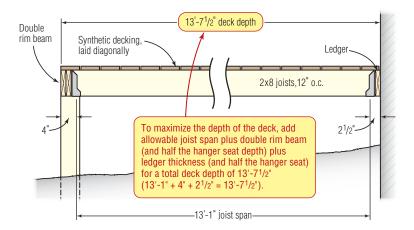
In this example, a deck with a flush double rim-beam with an outside dimension of 13 feet 6 inches and synthetic decking laid diagonally, choose the 12-inch-o.c. joist-spacing column. From the table, find the closest allowable span: 13 feet 1 inch (2x8s at 12 inches o.c.) under the 40-psf southern pine row. Adding 4 inches (to account for the double rim beam and half the width of a joist hanger) and $2^{1/2}$ inches (to account for the ledger and half the width of a joist hanger) to the 13-foot-1-inch joist span yields a 13-foot- $7^{1/2}$ -inch maximum deck depth.
